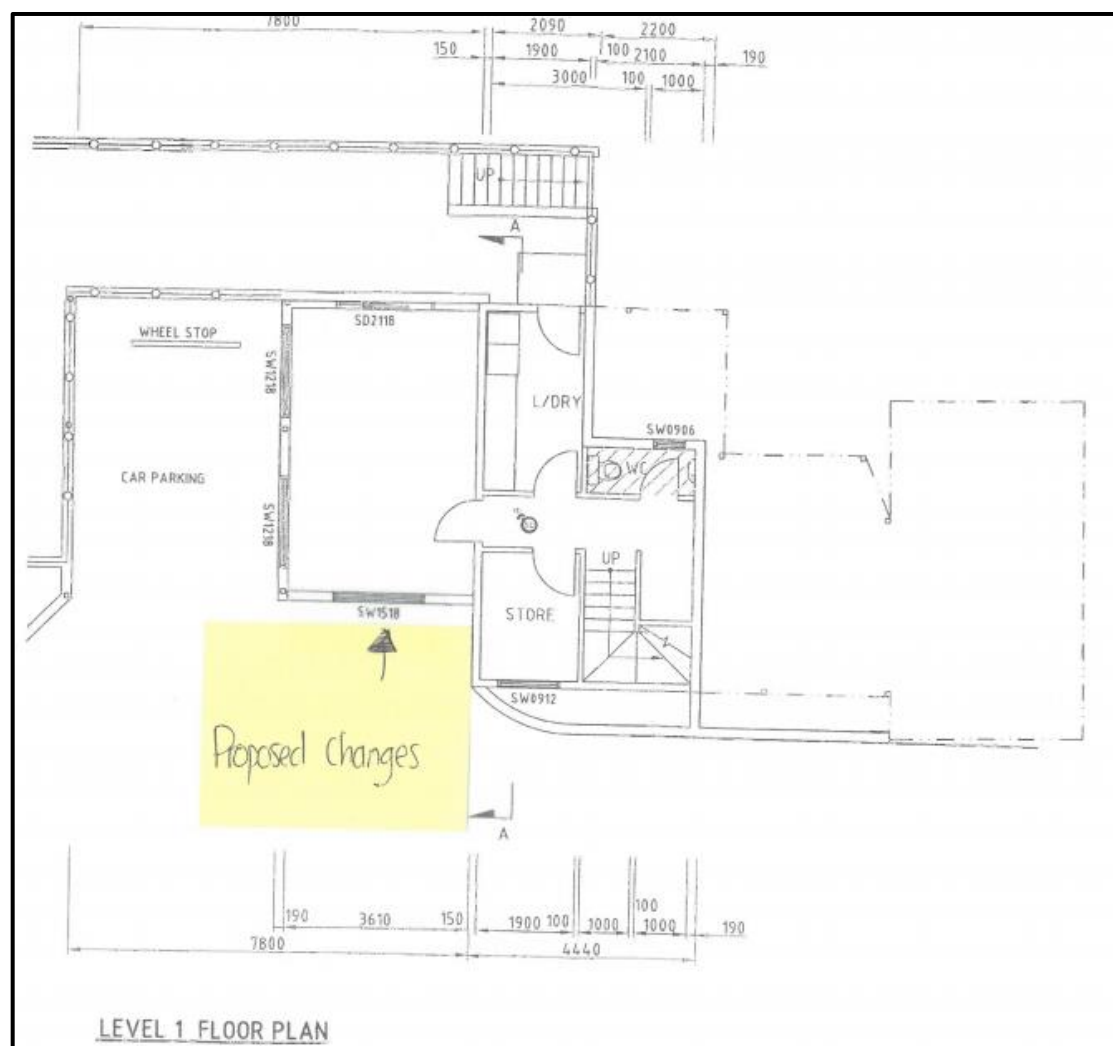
Site Plan for 2/10 Bowden Street, Glenorchy
